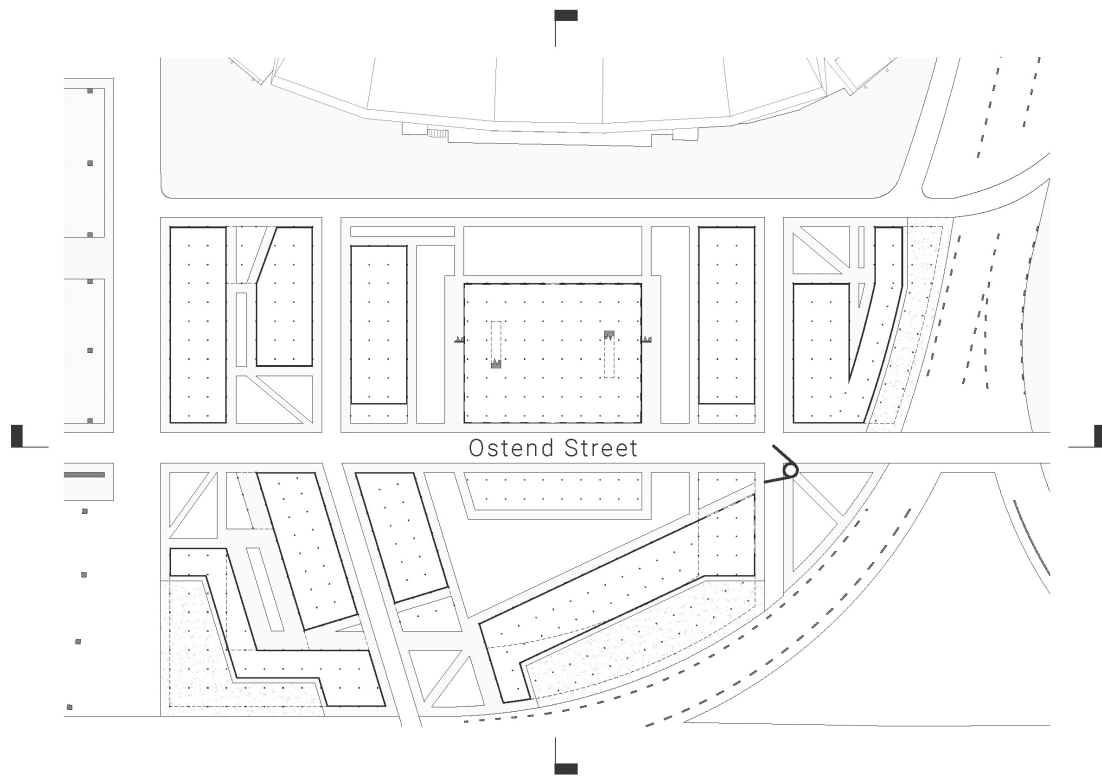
, Urban Center - Enlarged Plan (Source: Drawn by Author)
